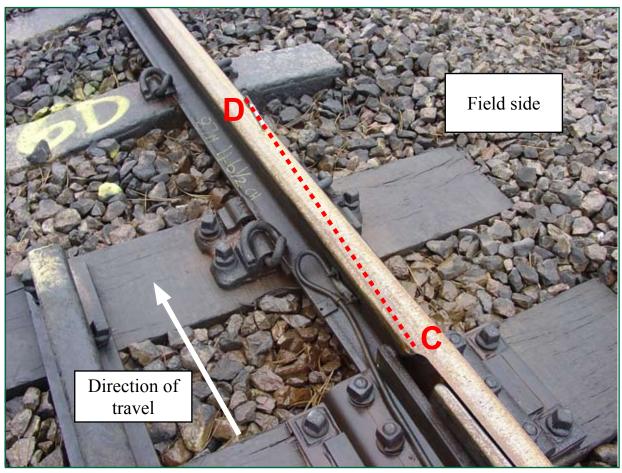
Photograph of adjustment switches showing point of impact with the machined notch (C) and derailment mark indicated by the position of the pen on rail head (D) where right hand wheel landed after being in free flight for 700 mm (grinding marks are visible on the rail head, showing light corrosion following overnight rain).
